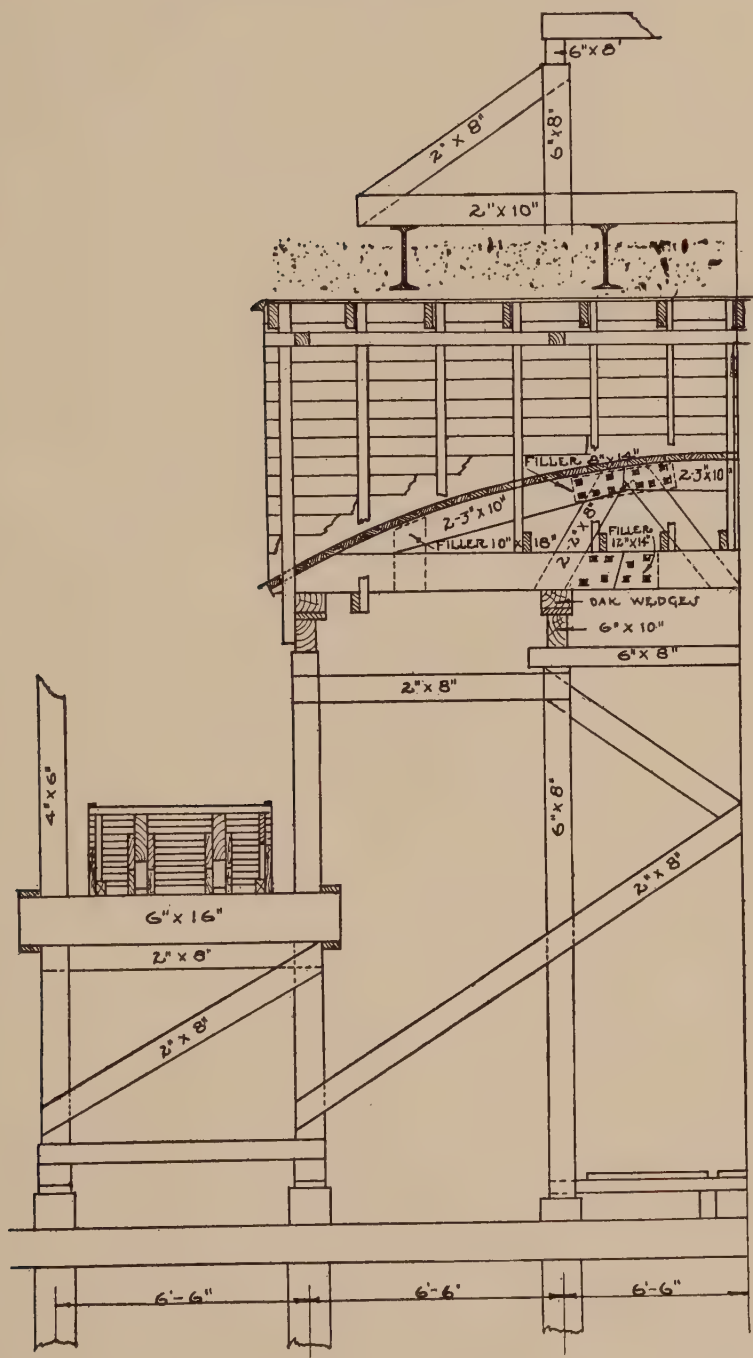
Shows half section A-A (see Fig. 223a) including centering at floor beam "C."
